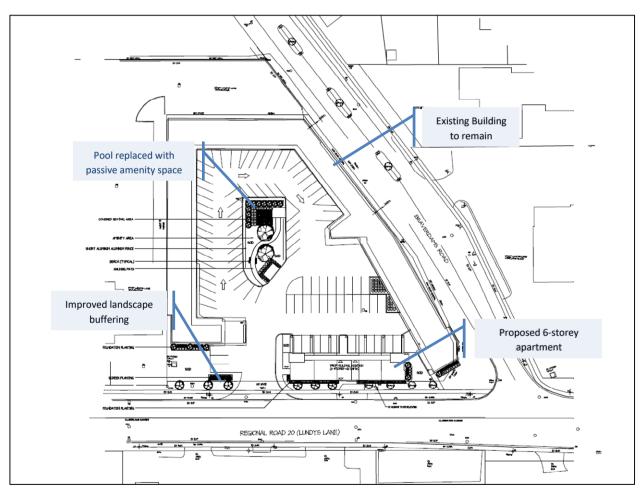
Proposed Site Plan with Landscaping (Landscape Florida)
